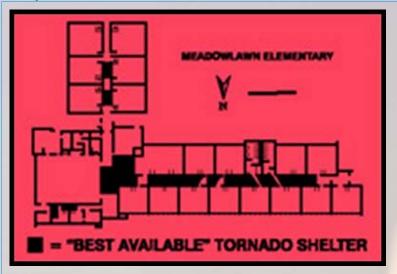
An example of a building's tornado safety plan sign directing people to safe places.
